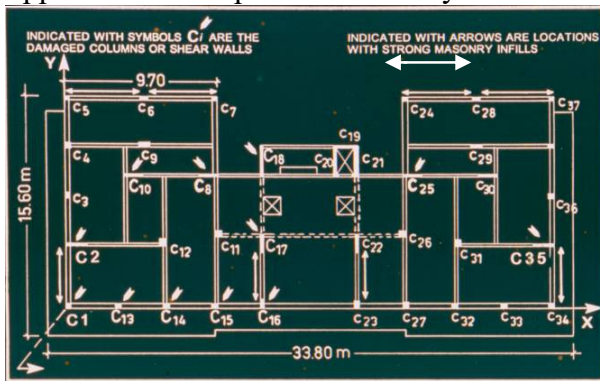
Plan of the “soft story” of the “Pyrgos Hardas” building [1].
